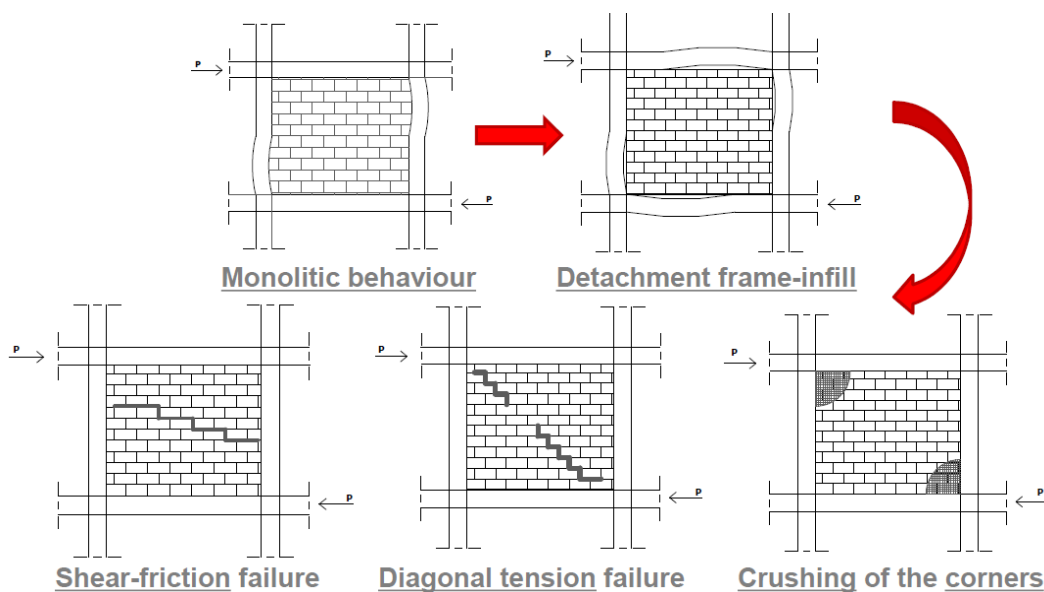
Damage/failure mechanisms for URM infill walls (Rodrigues 2014)
